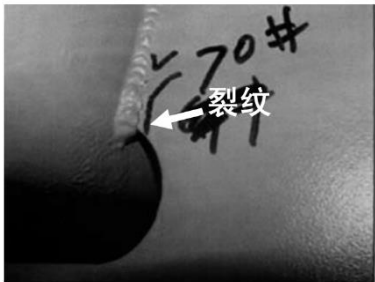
Rib-to-deck weld fracture in Severn Bridge (Wolchuk, 1990)
